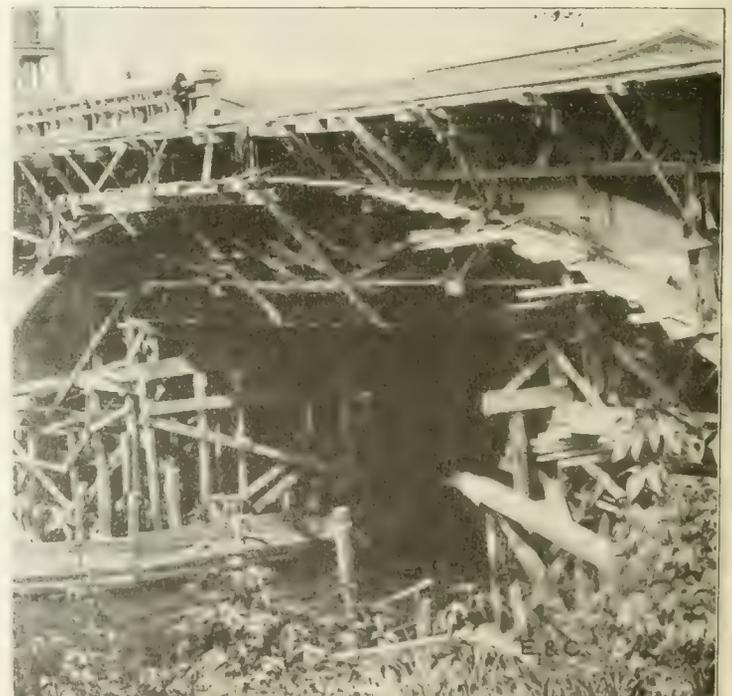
View of Centering and Supports for 110-ft. Span of San Jacinto St. Bridge. Note Opening for Navigation.
